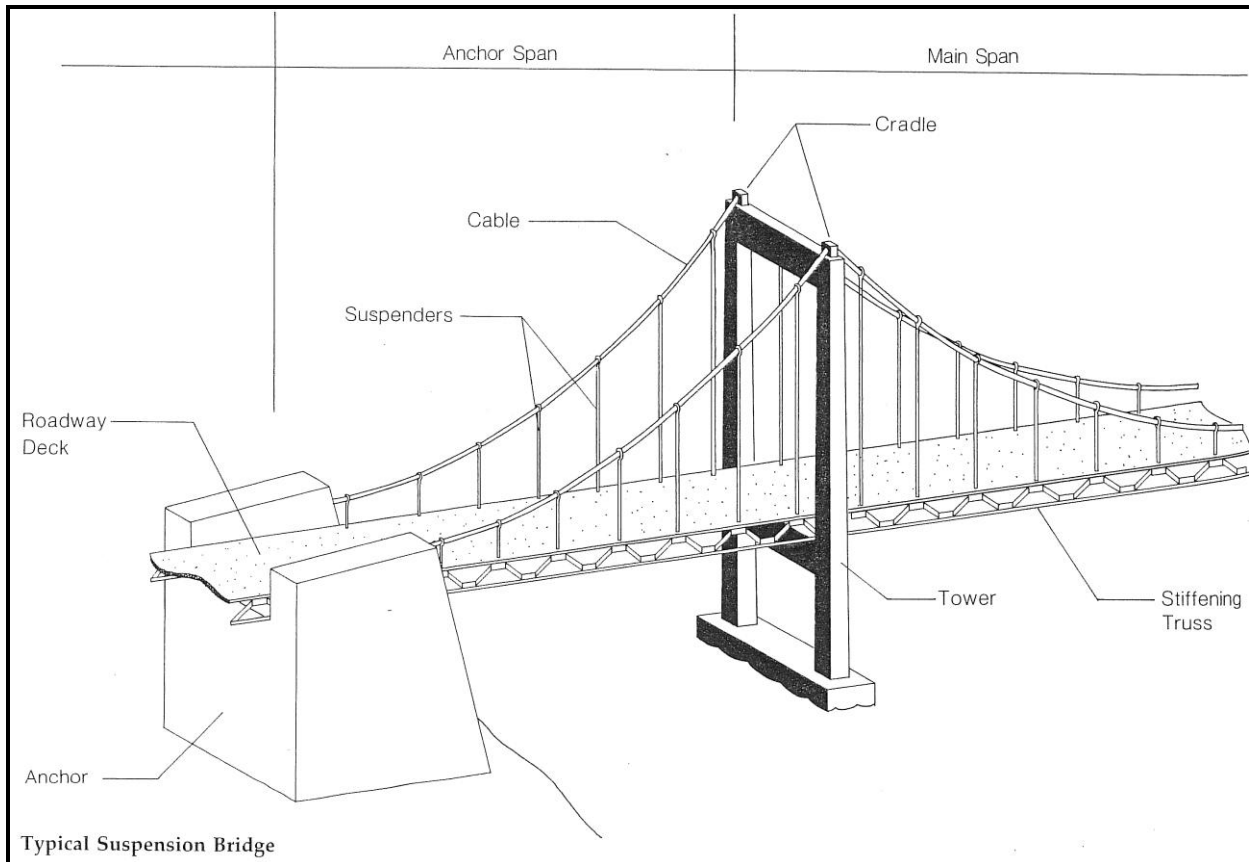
Typical Example of the Construction Methods of a Suspension Bridge²³⁹
